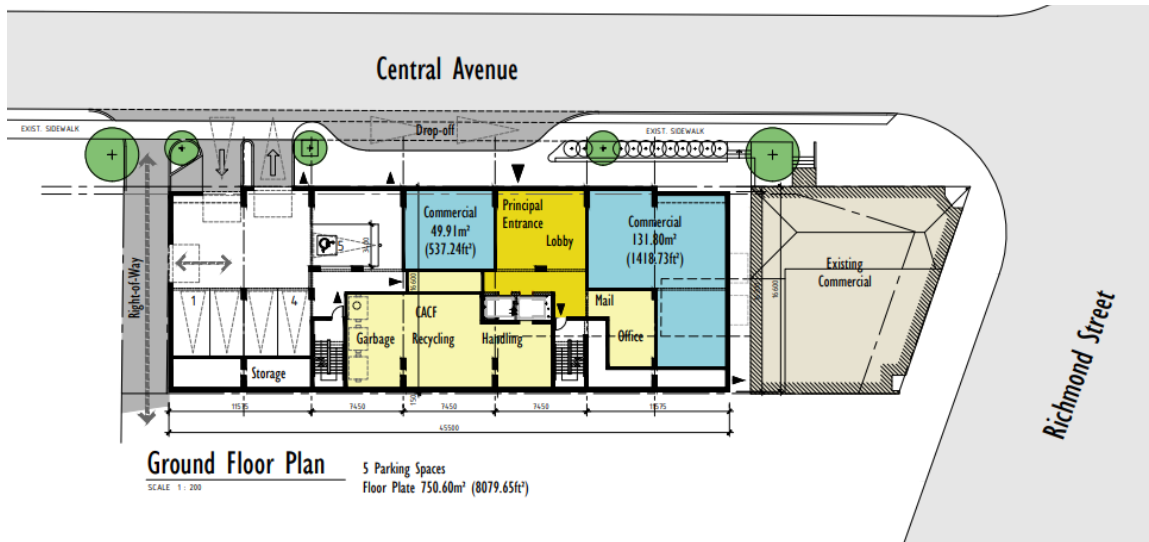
Excerpt of draft ground floor plan (Source: R. Tomè and Associate, 2020)
